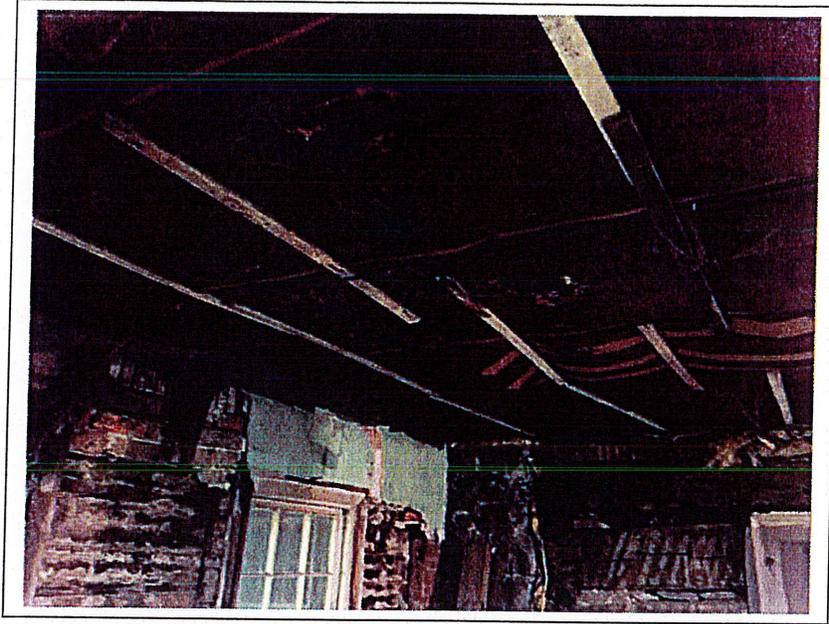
Mold on Ceiling Insulation in Back Addition
